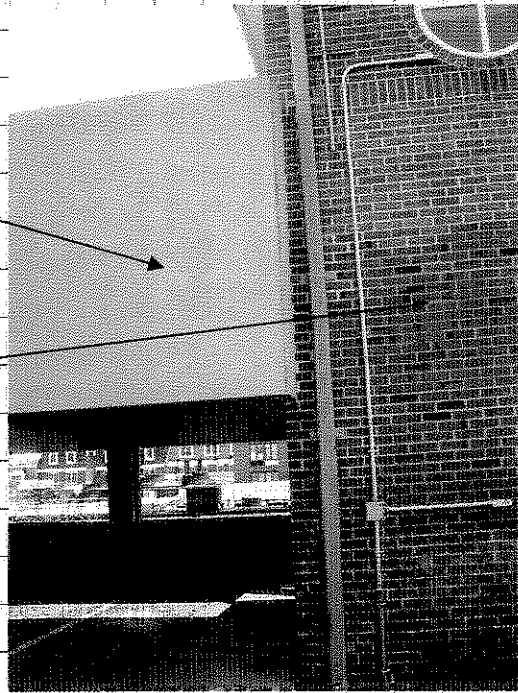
Exterior elevation at northeast corner (Grid 1.5B)
